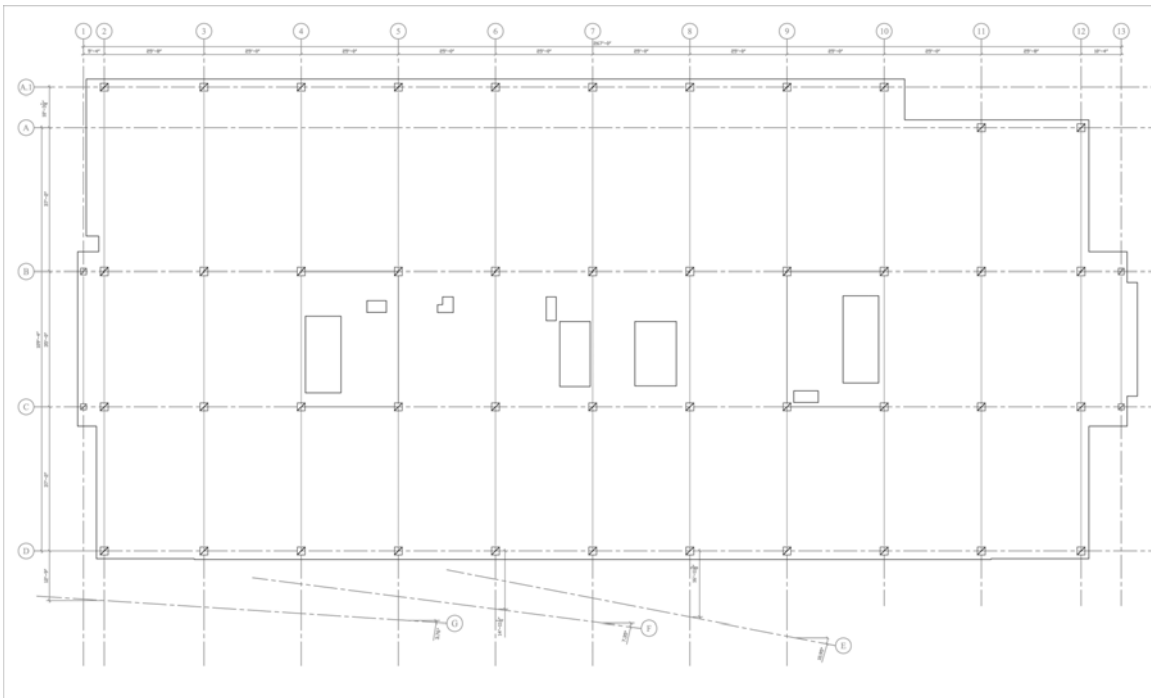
3<sup>rd</sup> Floor Plan – Concrete
